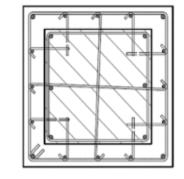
Typical cross sections of reinforced concrete jackets. Source: Stellos Antoniou
